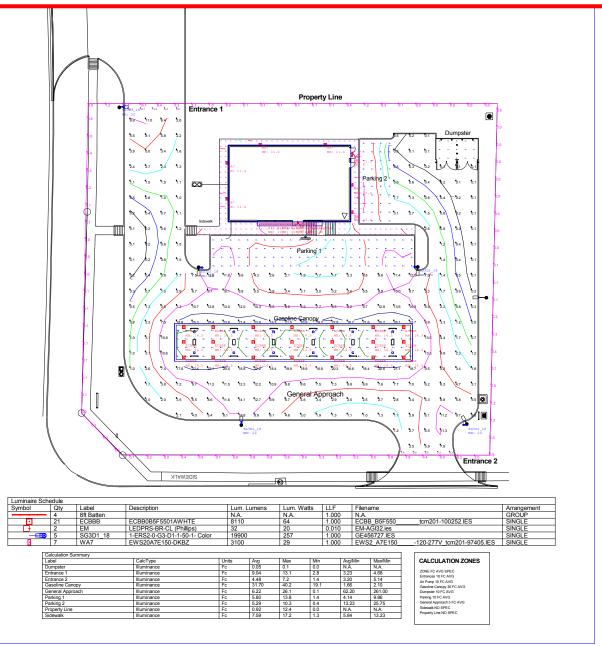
APPROVED 7-Eleven SITE PLAN
